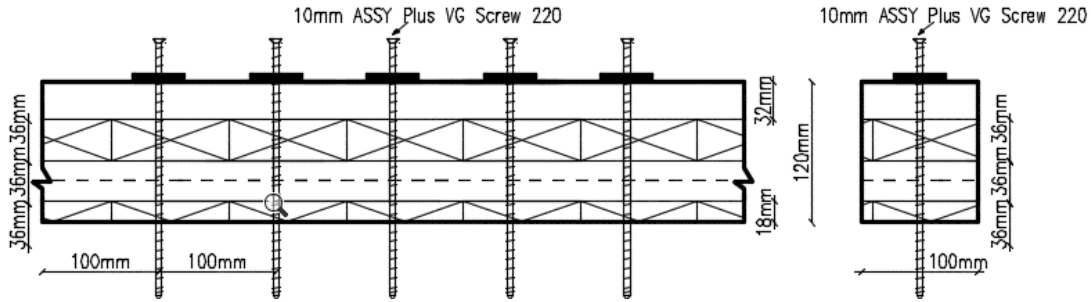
Series 6 layout: side section (left) and cross section (right)
